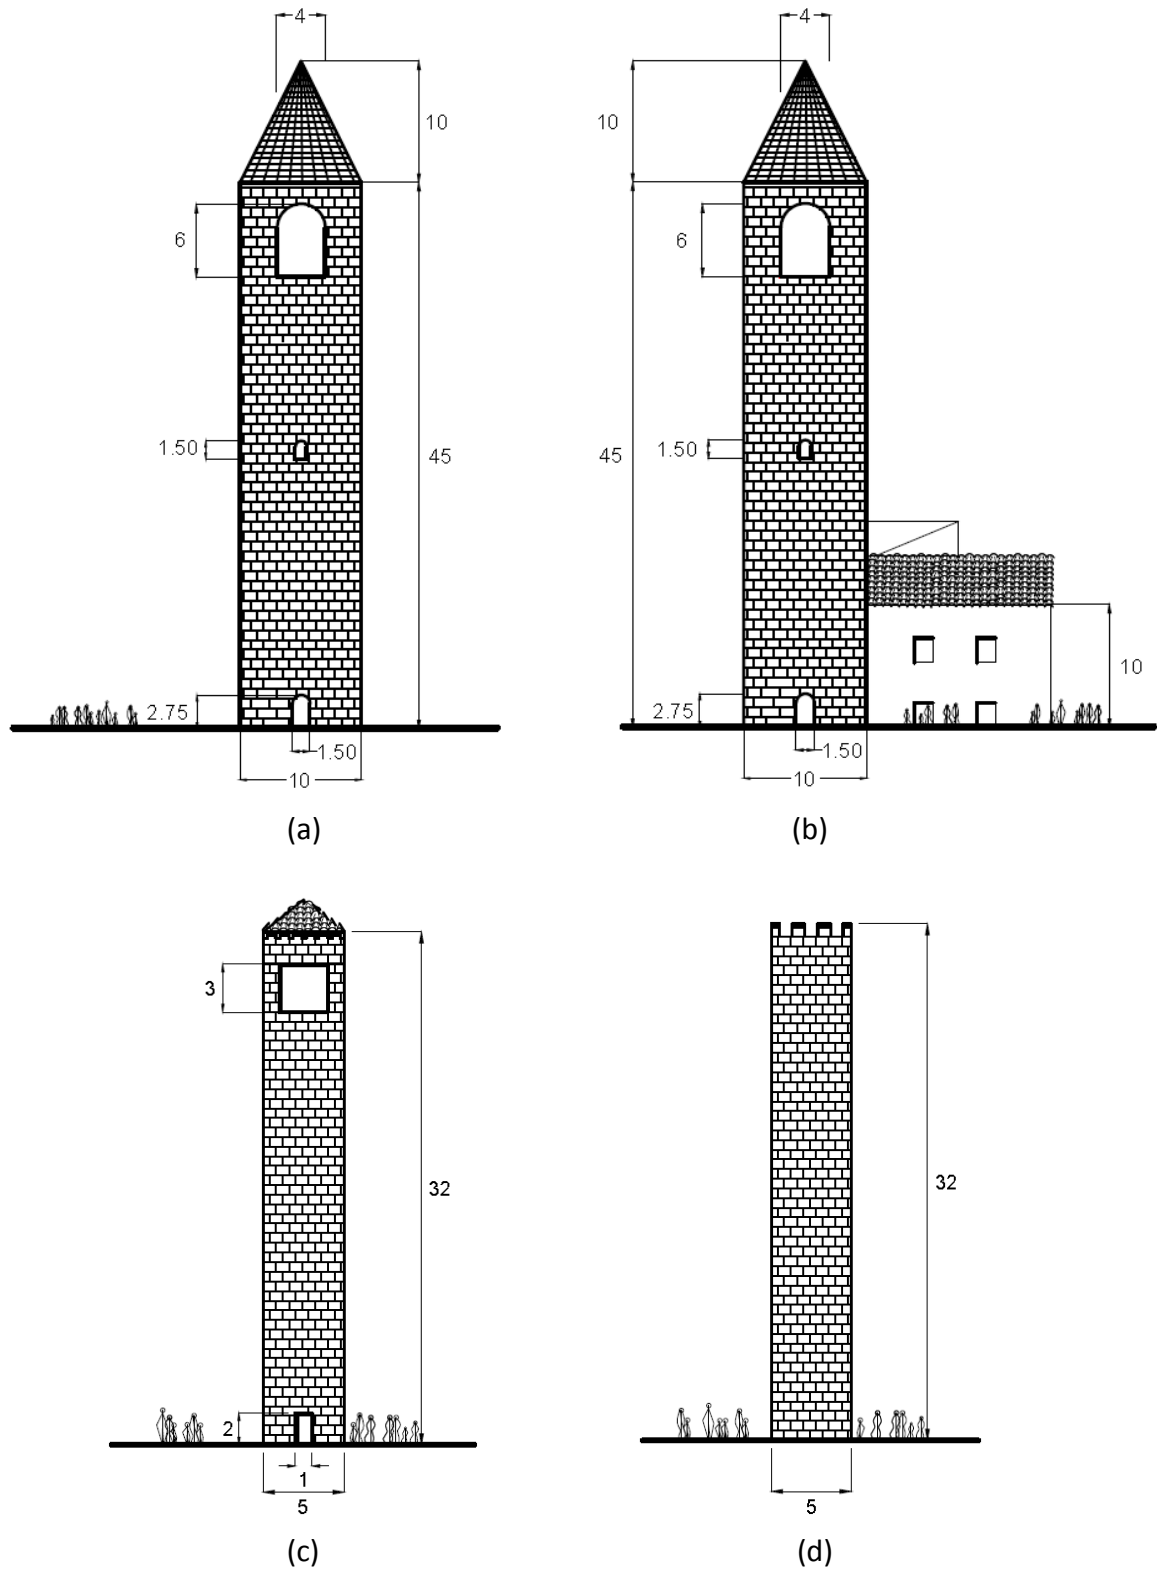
General view and dimensions (in m) of the four virtual historical masonry towers; (a) bell tower; (b) non-isolated bell tower; (c) bell tower and (d) medieval tower
